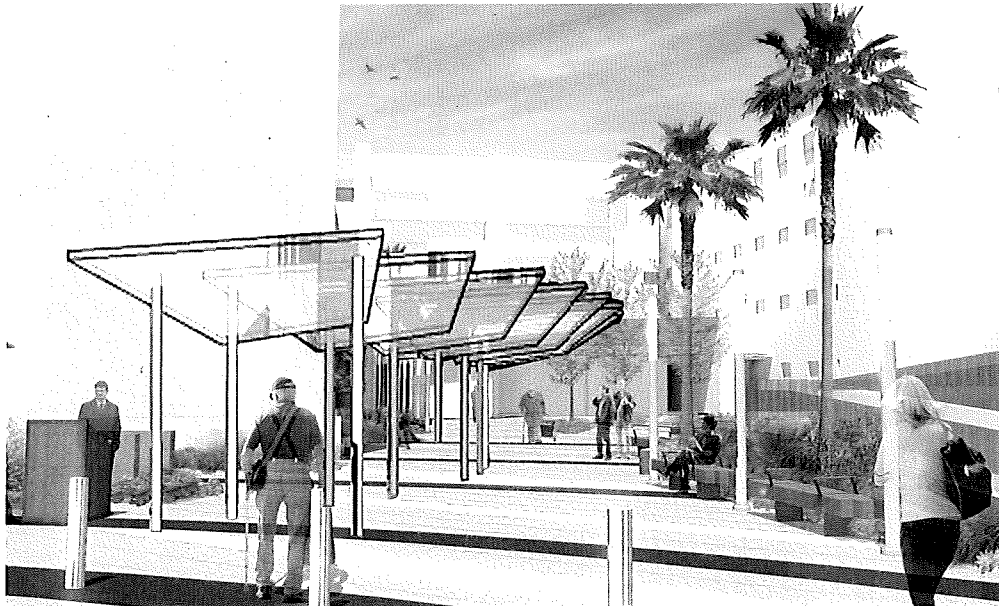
Location of the proposed drop-off area looking northwest with Building 1 (right side) and Building 203 (left side). (Source: Taylor Design)
